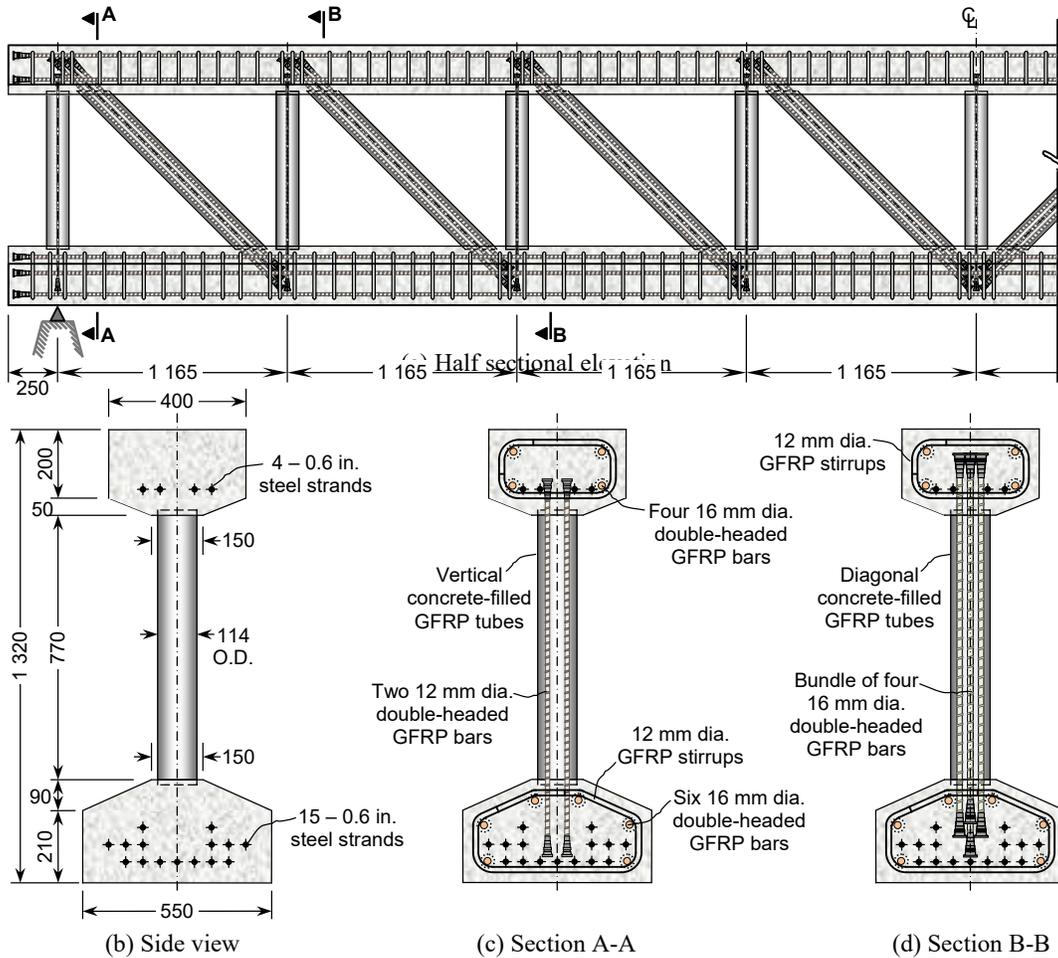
Dimensions and reinforcing details of the FRP-reinforced 8-panel girder.
